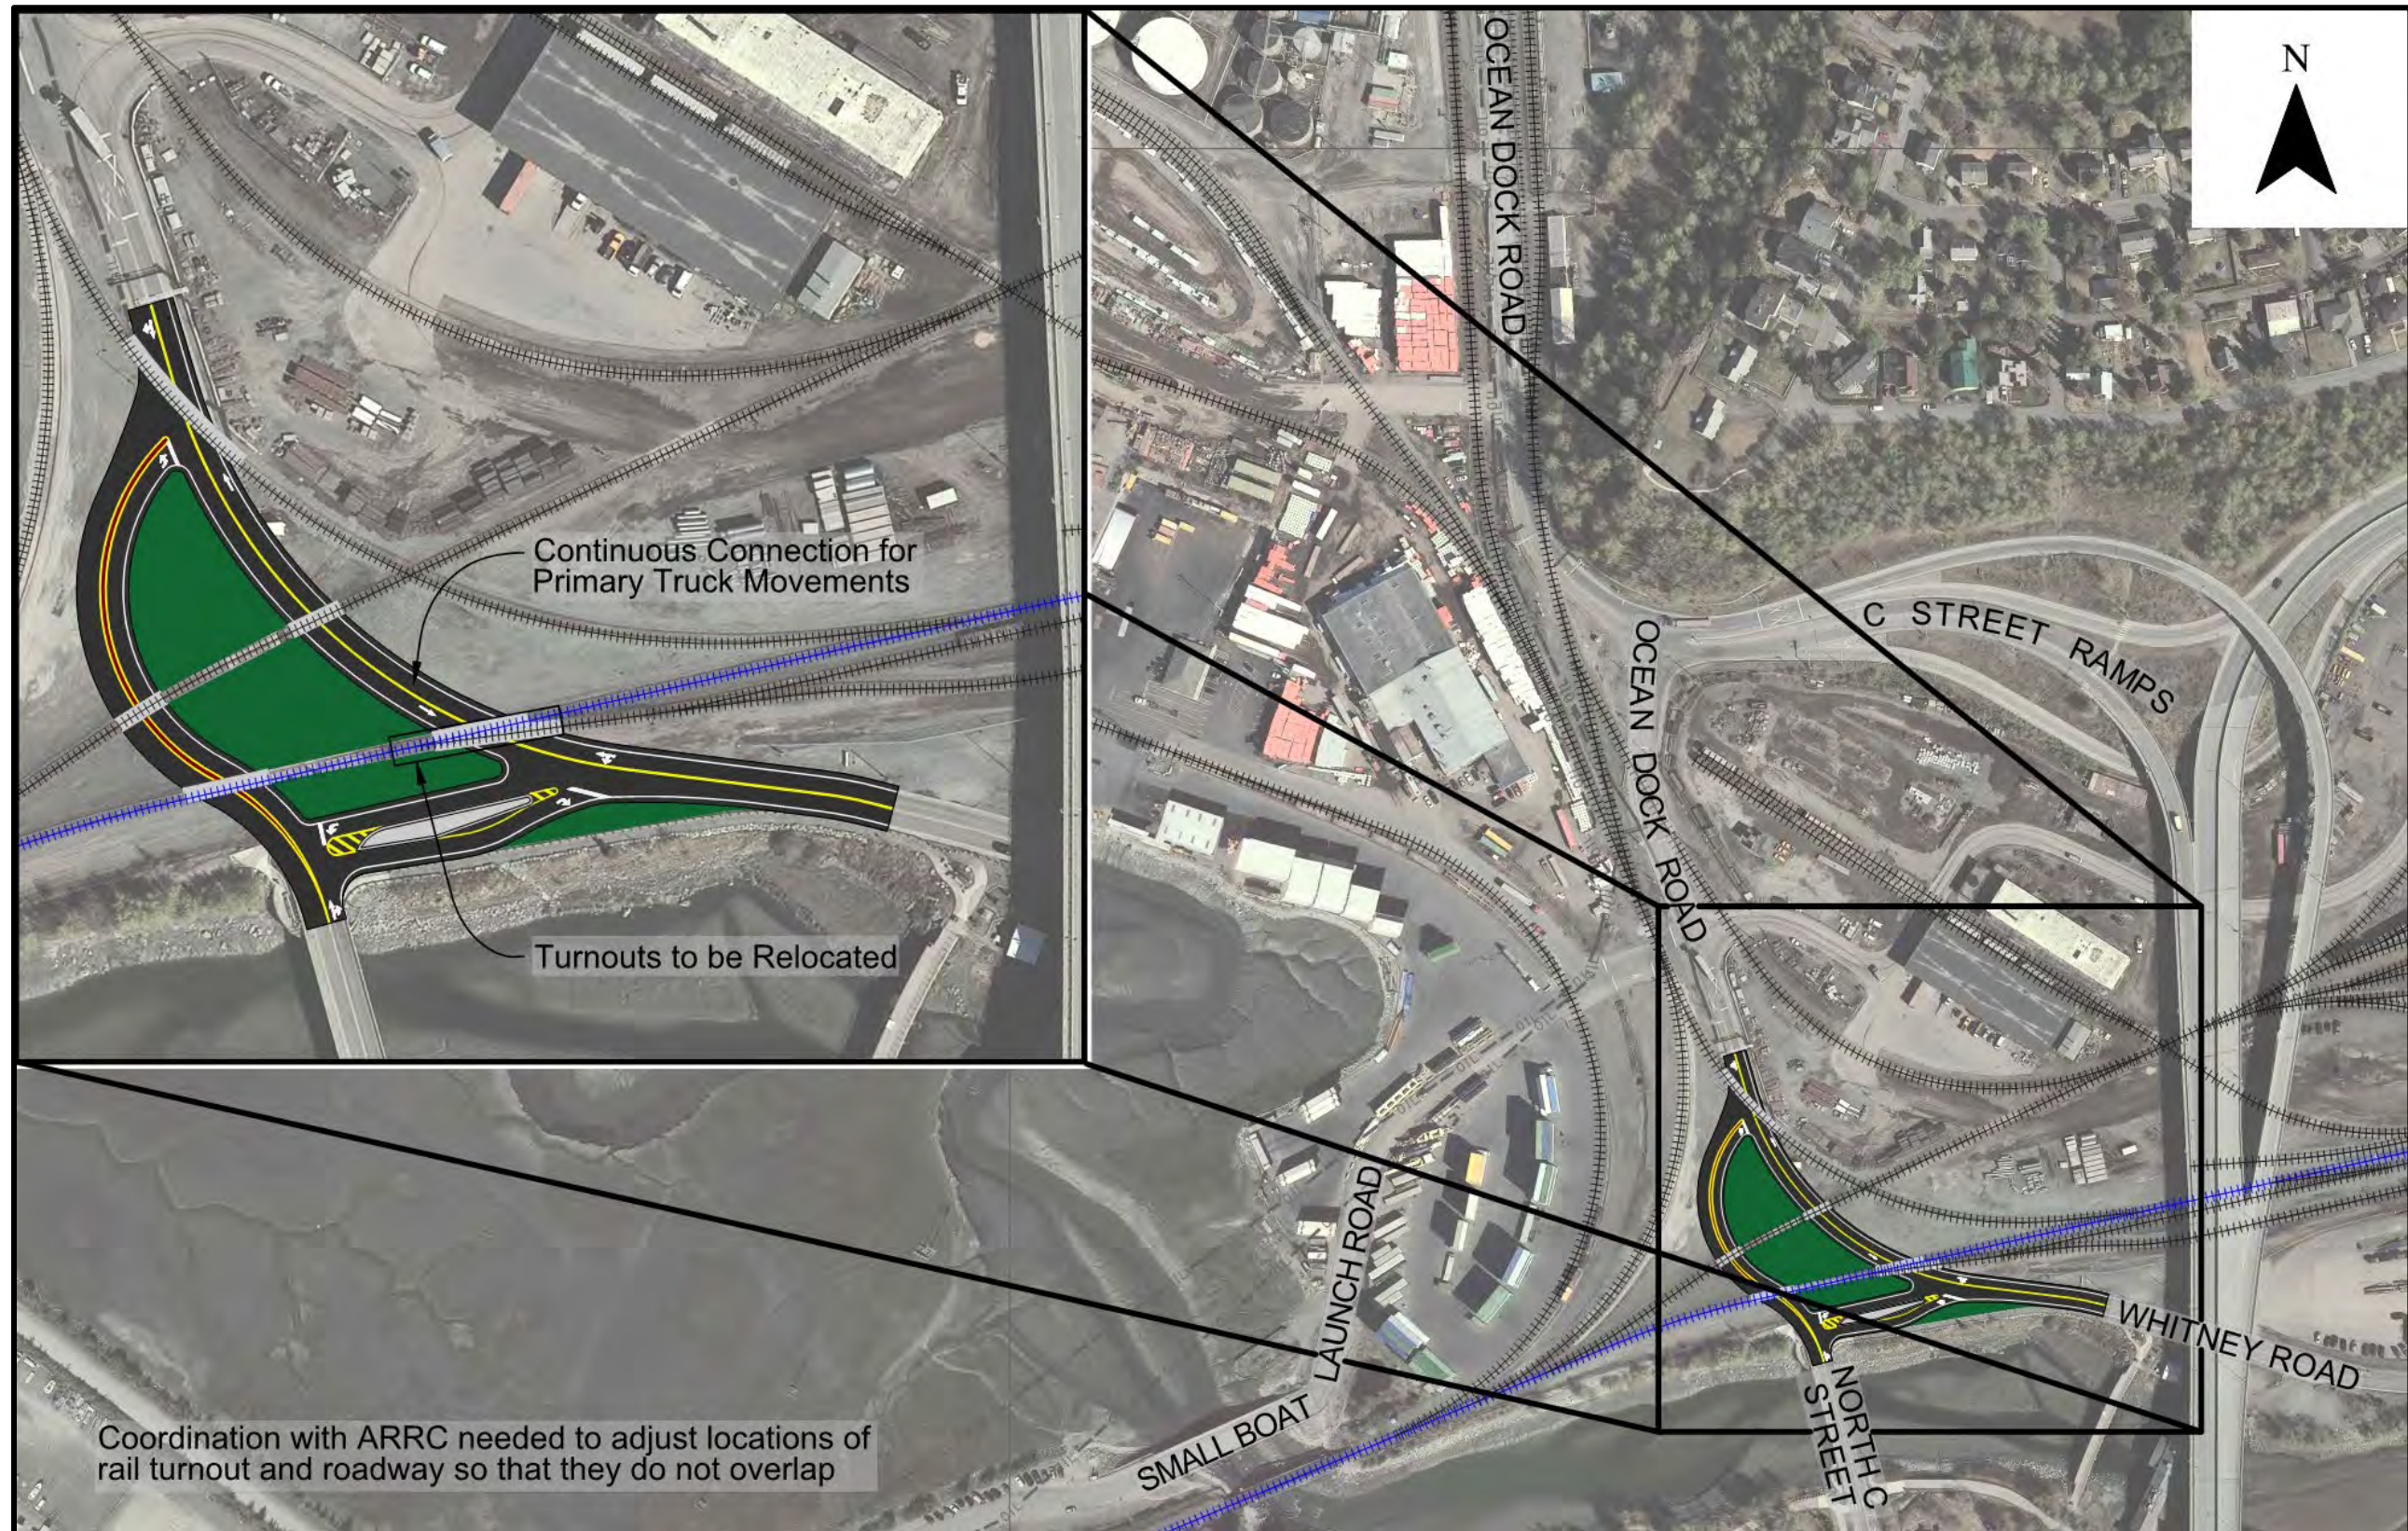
Road Concept D – Whitney Road Intersection Realignment – Option 2
